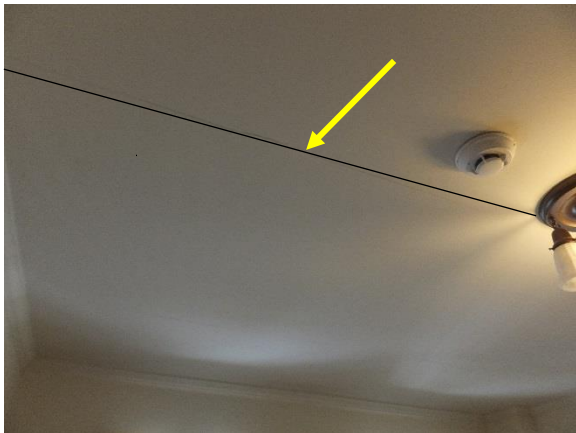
Horizontal cracking at light fixture in room 102 (bedroom/family room) likely between seams of drywall boards. Crack traced for clarity.
